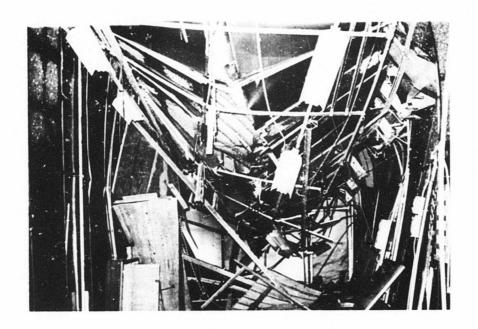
Snow-loaded arch pushes through roof of a reactor building in Trench 3.
